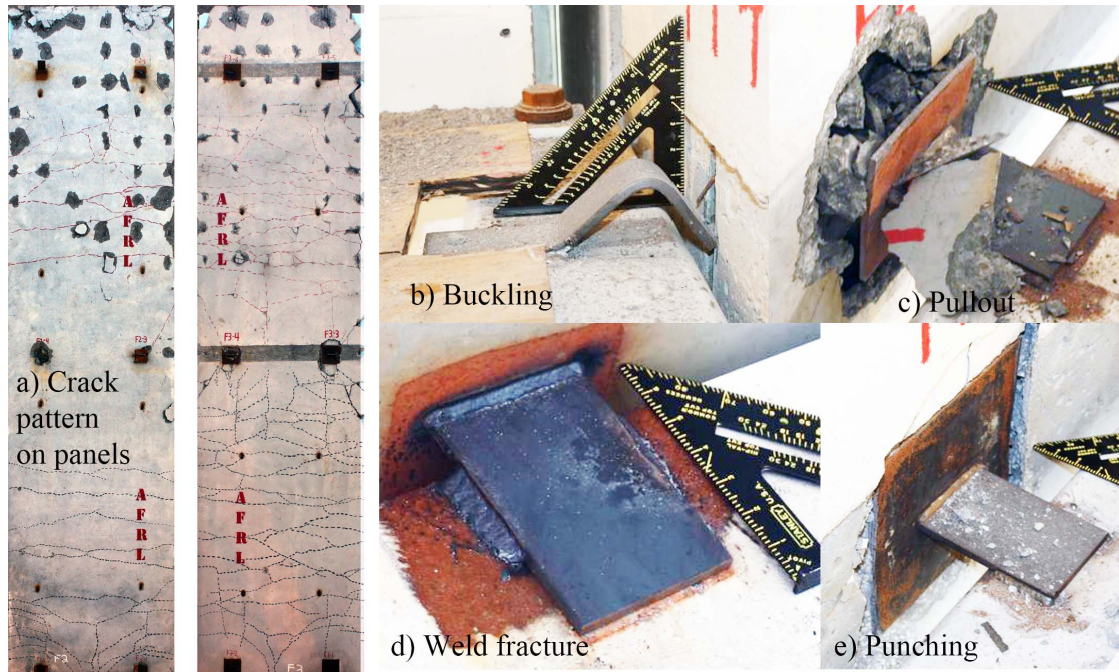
Bi-directional cracking around base connections on blast loaded panel (adopted from [25])
